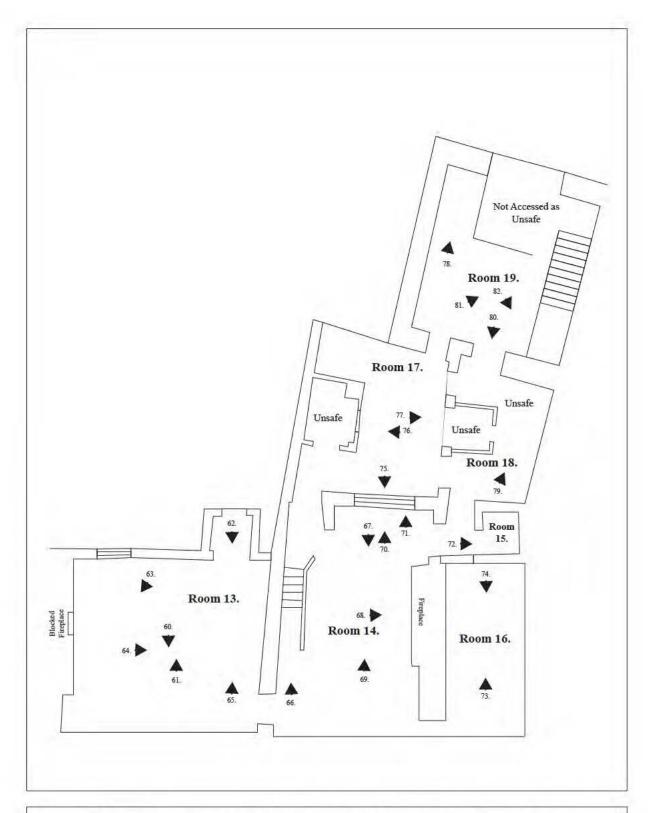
Plan of the Crown Inn at First Floor Level Detailing the Direction/Locations of Photographs Taken. Modified from Drawings Produced by Chris Pike Associates (Not to Scale). Please Note Probable Inaccuracies in the Plan Angles
